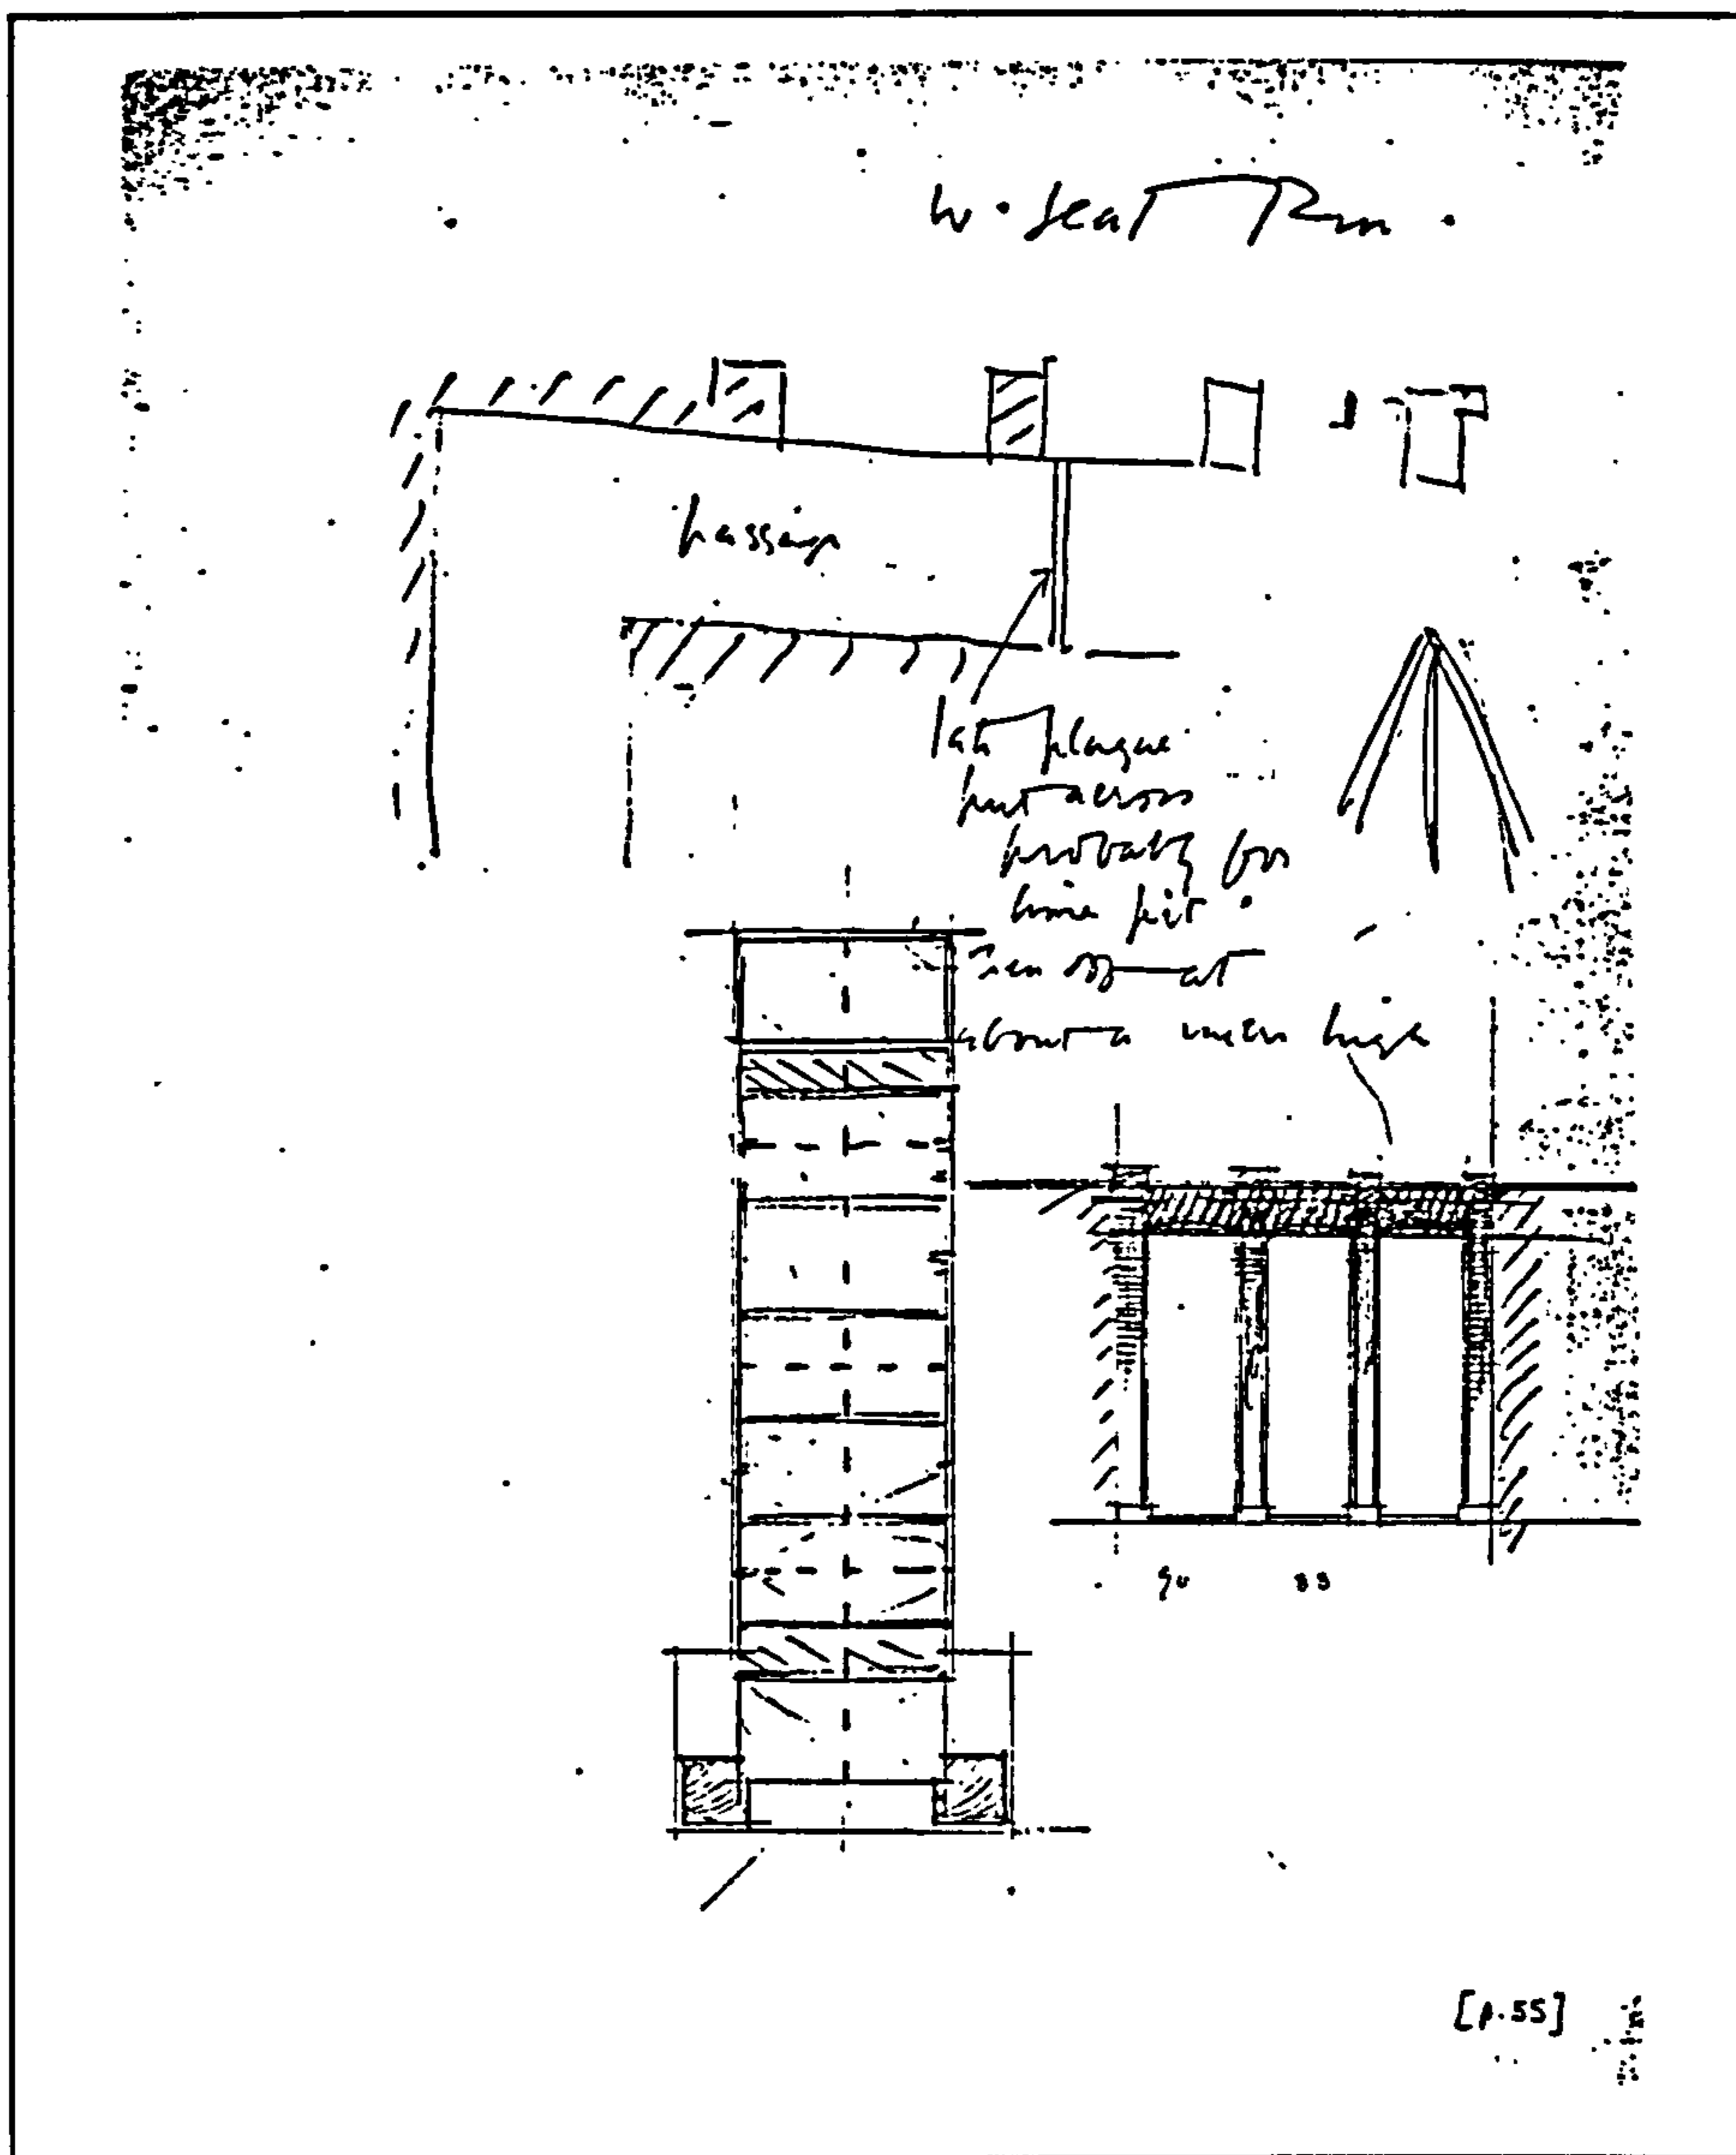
Ground plan of the brick pillar (centre bottom) and elevation of the east wall. Room of the Plaster Couch. Sketch plan by Theodore Fyfe.
